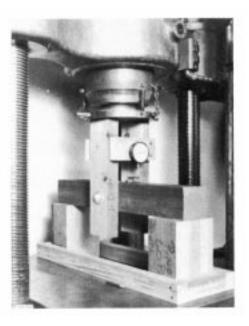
Assembly for Testing Bolted or Connectored Joint Perpendicular to Grain in Compression
